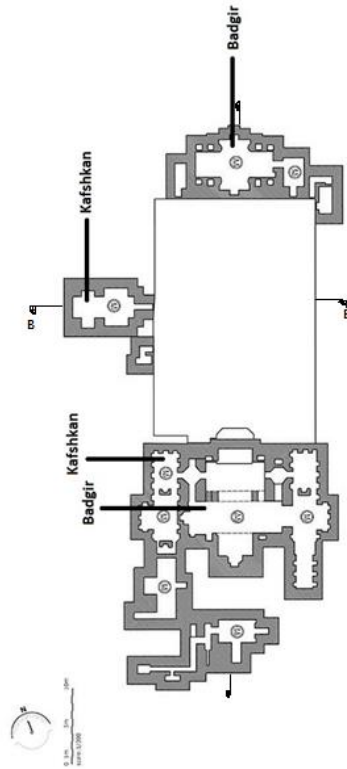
Broujerdi House (Basement floor) in Kashan (URL 18)
